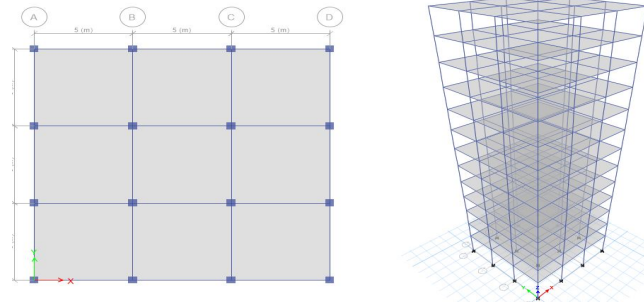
Plan and 3D view of G+12 multi-storied building without TM
